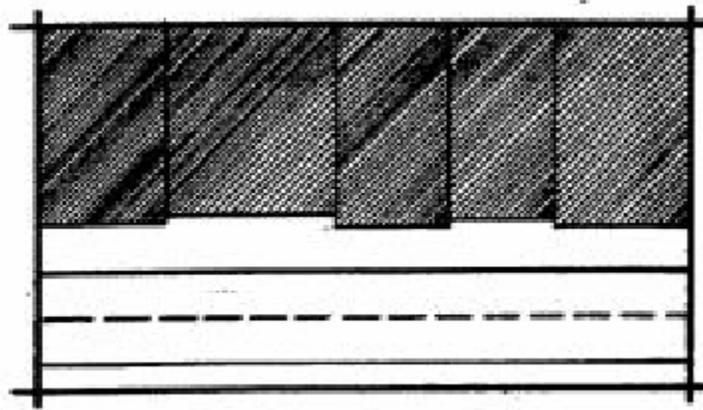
Diagram of typical building setbacks in a Mixed Use Area – there are no minimum setbacks⁵¹
